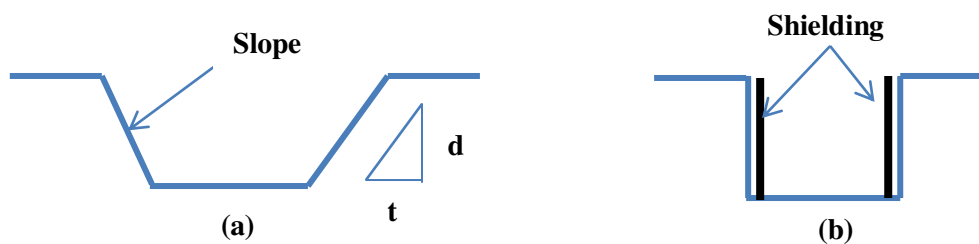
Types of excavations : (a) Slope excavation ; (b) shielded excavation
